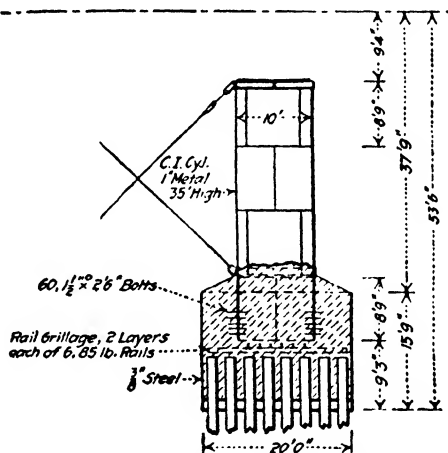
Typical Cylinder Pier. Elizabeth River Bridge, Norfolk and Western Railway.
